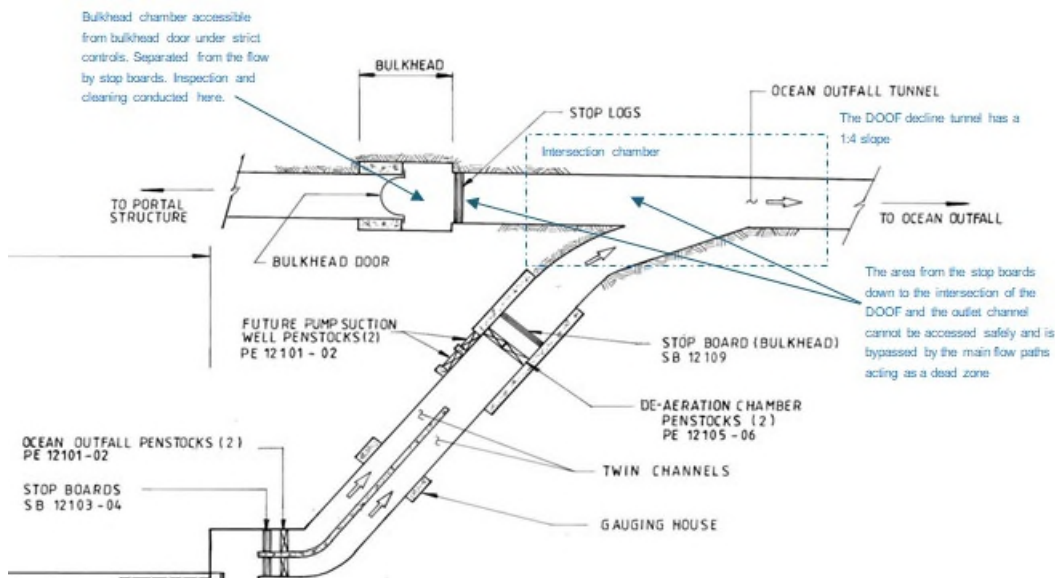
The bulkhead door, bulkhead chamber and intersection chamber of the Malabar DOOF with the plant outlet channel
